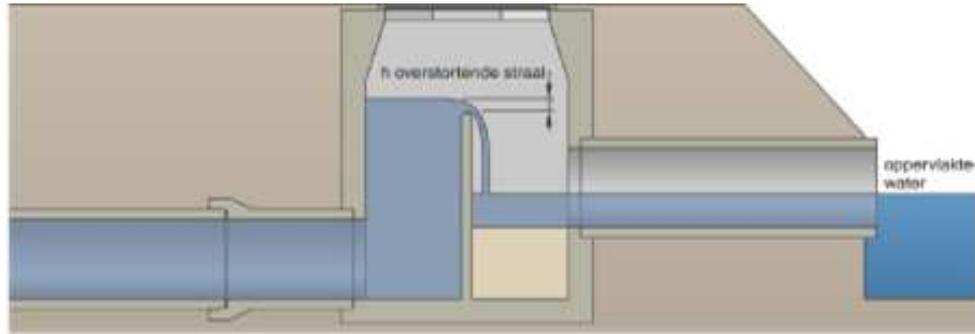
Principle of overflow weir constructed inside a sewer manhole. Water flows from the sewer system (left) over the weir towards surface water (right). (Courtesy of VPB)
